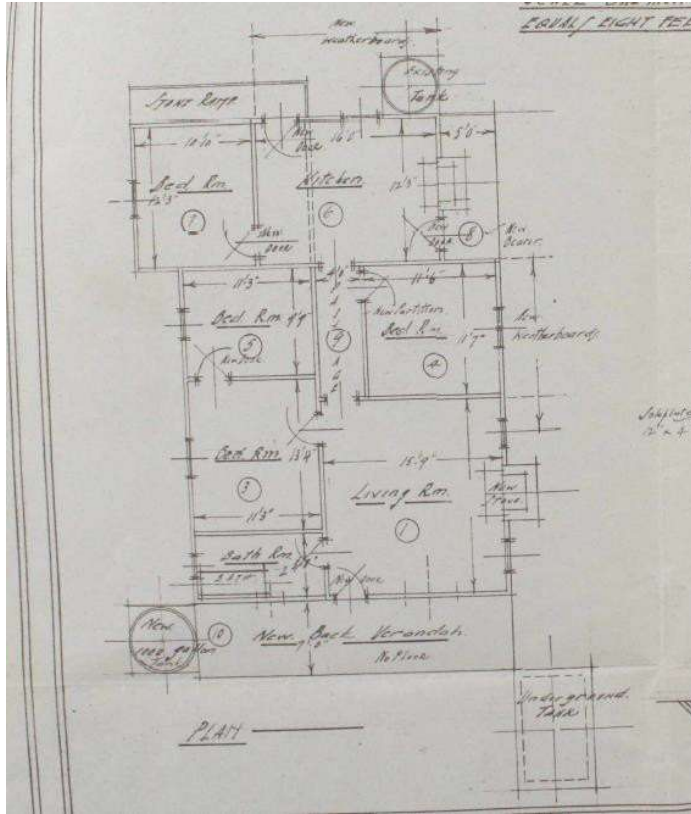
Architectural plans of changes to the existing residence at 162 Murray Road for Ernest Johns from the Lands Department file.
